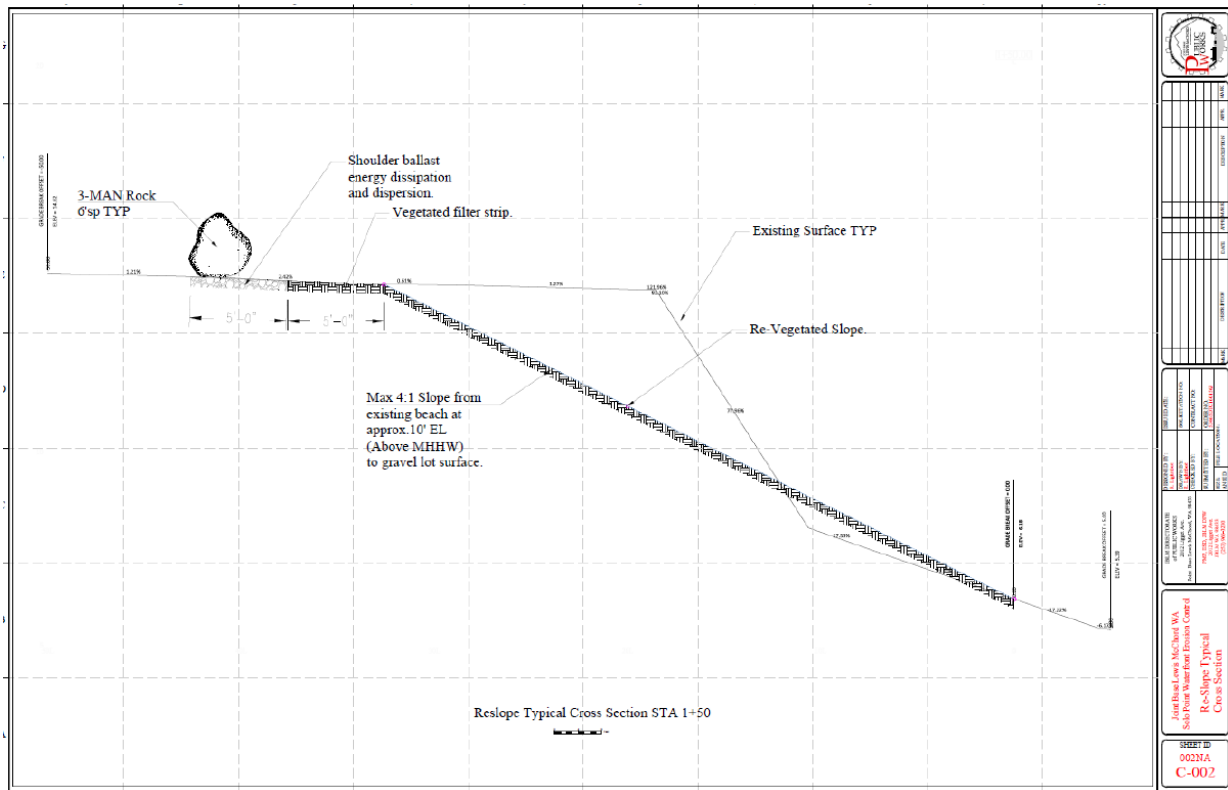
A shoreline cross section plan for erosion control at Solo Point showing soft shore armoring as “re-vegetated slope”, a vegetated filter strip, dispersion strip, and boulder placement.
